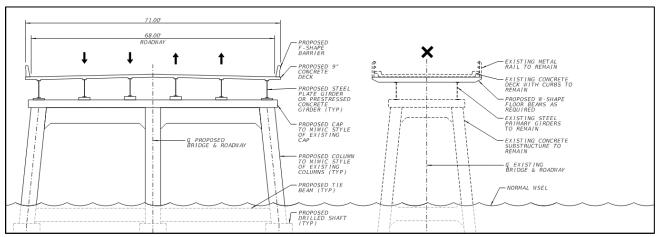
Alternative 5 Typical Section (Approach Spans – Not Showing Substructure Retrofits)
